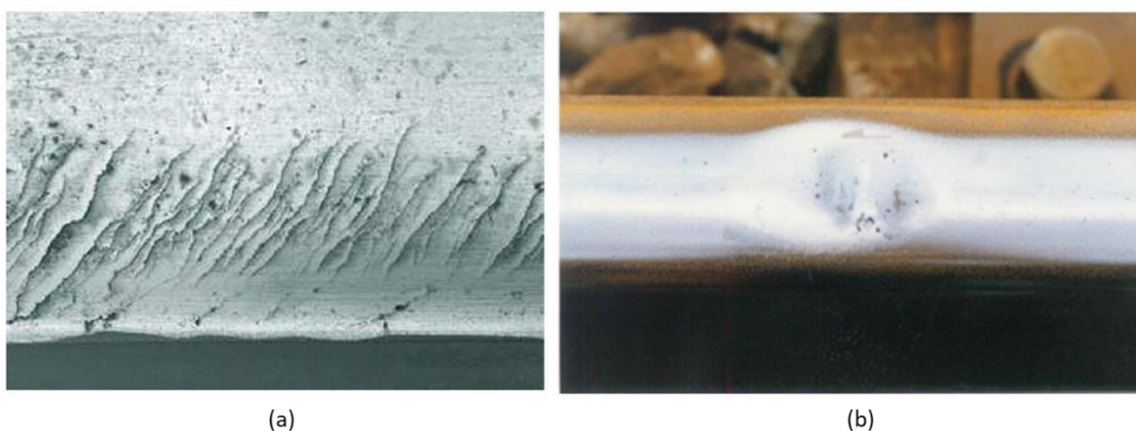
Typical rail RCF cracks: (a) head checks on the surface of a rail [151], and (b) typical squat defect (single squat) [152].
